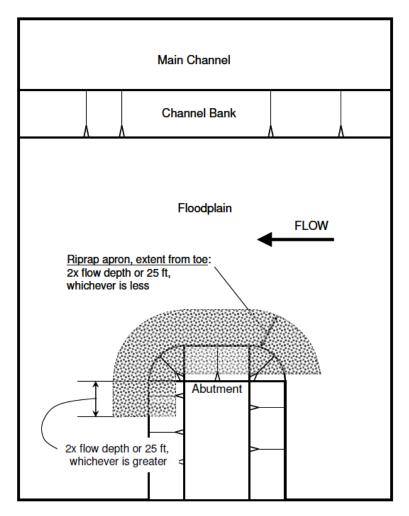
Plan View of the Extent of Rock Riprap Apron for Abutments (Figure 14.7 from Ref. 6)
